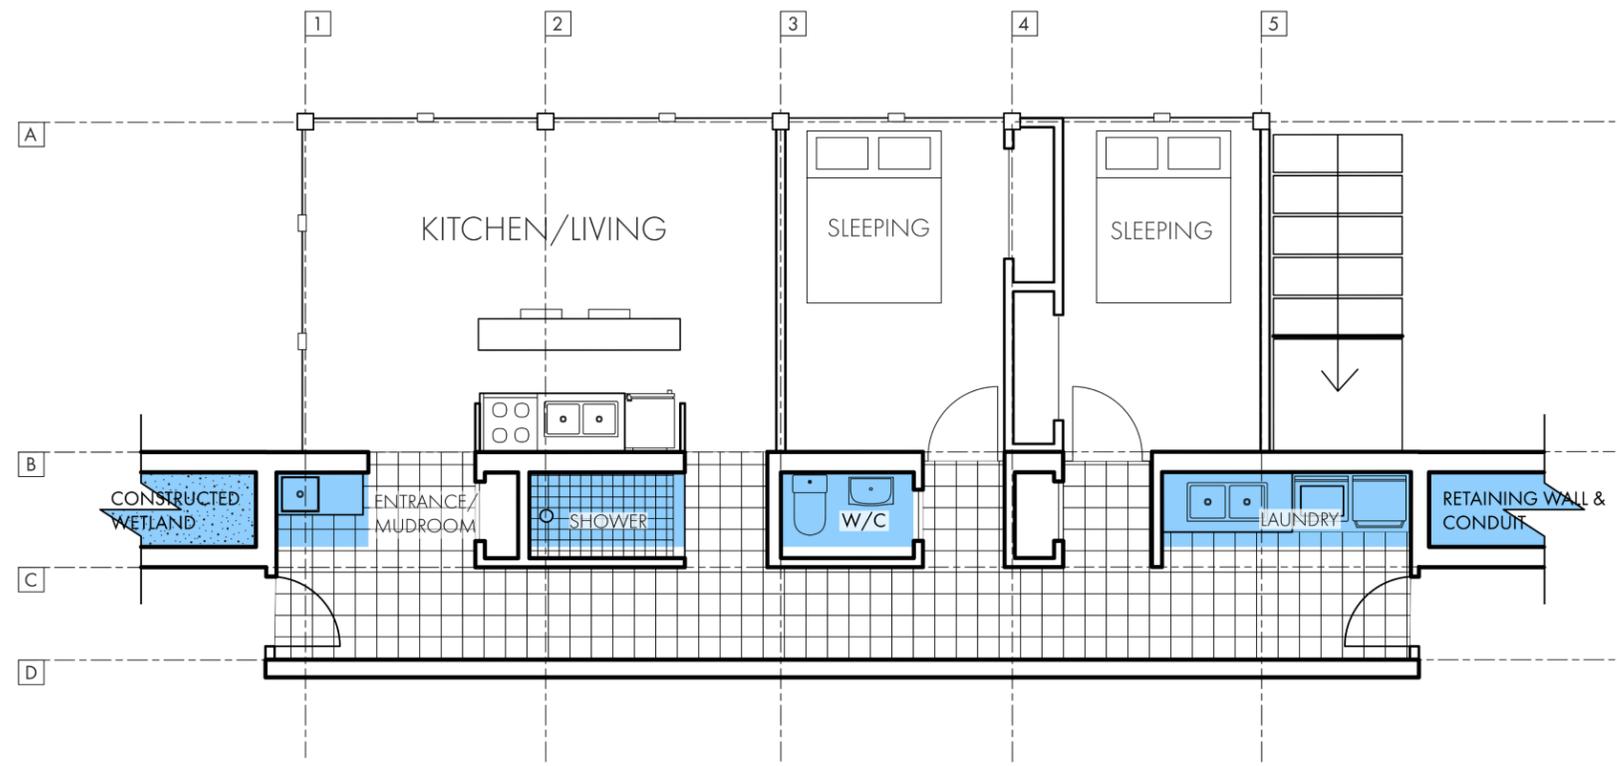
1:50 TWO-BEDROOM UNIT PLAN
